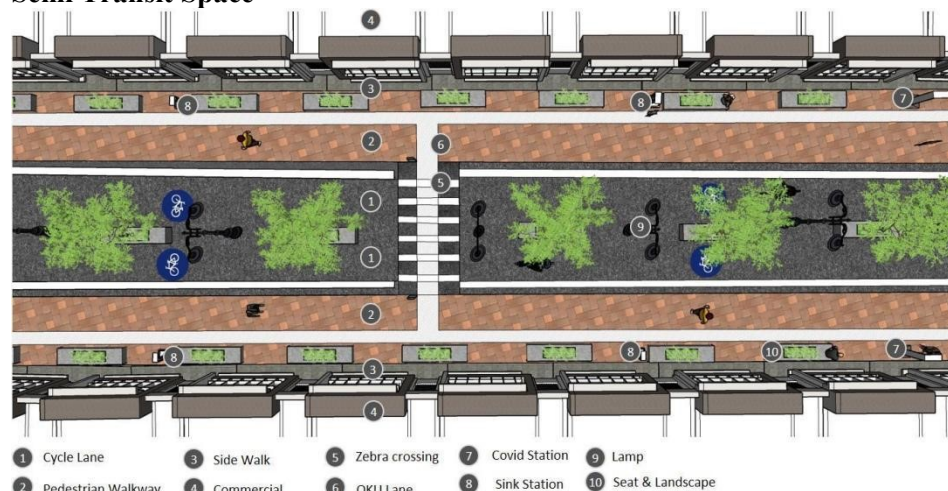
Proposed pedestrian walkway (Semi Transit Space)
